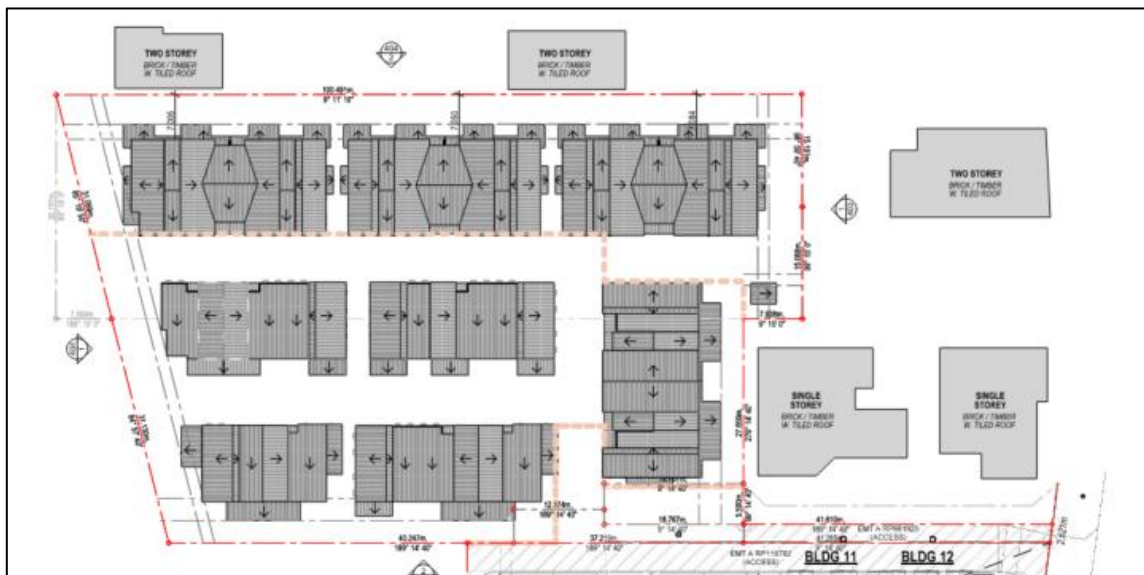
Proposed Roof Plan (Stages 2 & 3).
